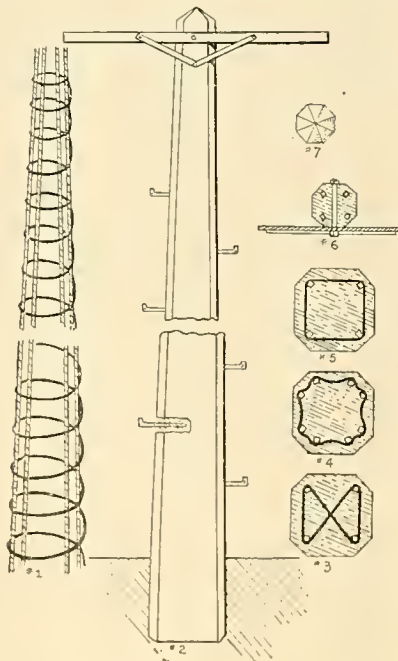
DETAIL DRAWINGS OF BAILEY CONCRETE POLE.
